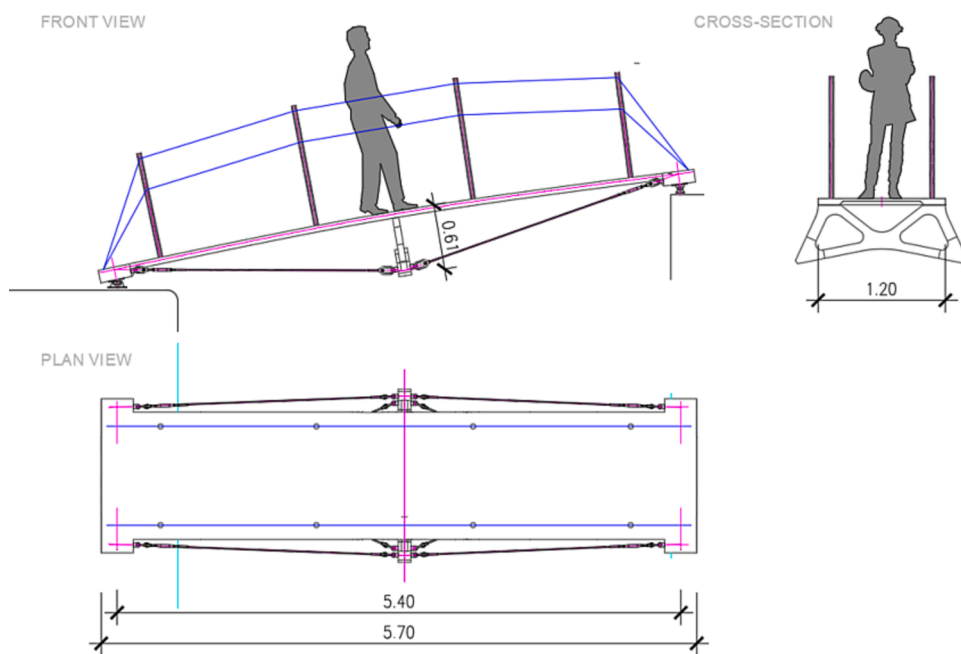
Front view, plan view and cross-section of the experimental footbridge. Dimensions in m.
